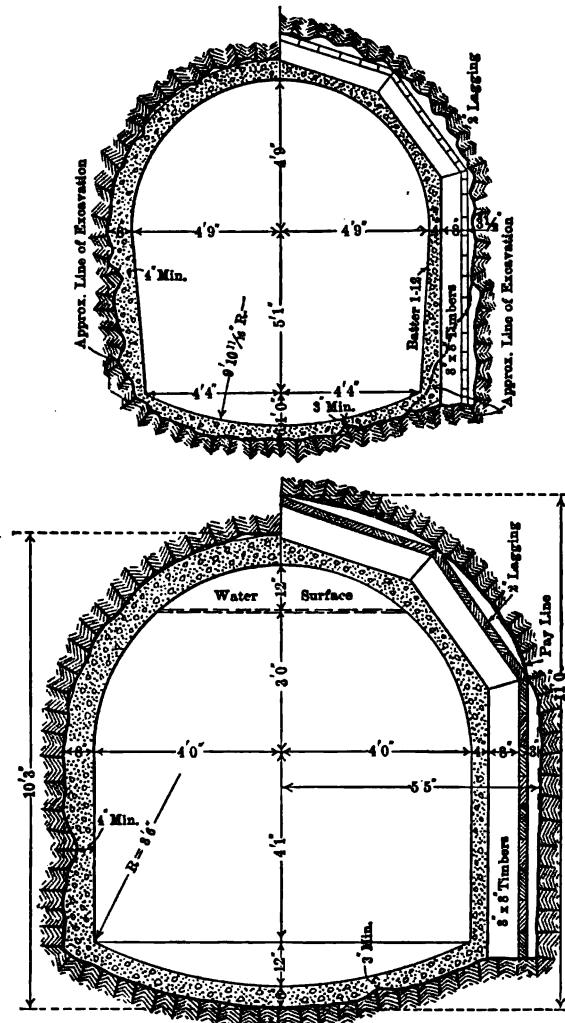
Cross-sections of typical tunnels, Los Angeles Aqueduct.
